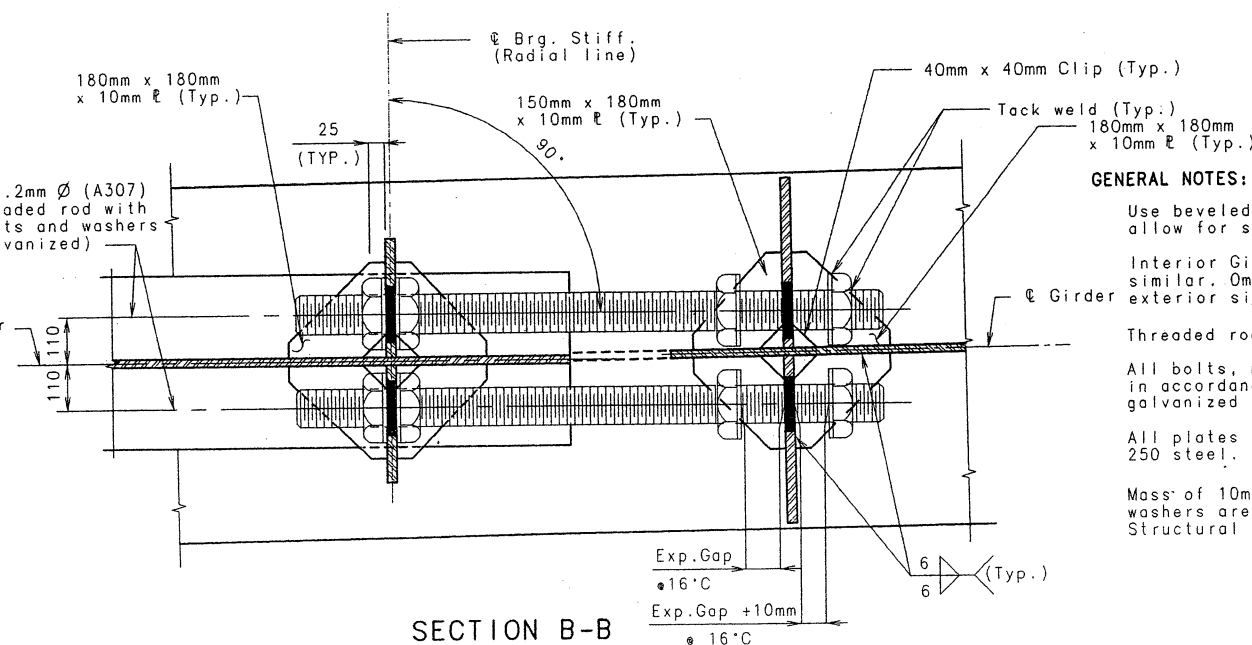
DETAILS AT HINGED CONNECTION NEAR BENT NO. 7
